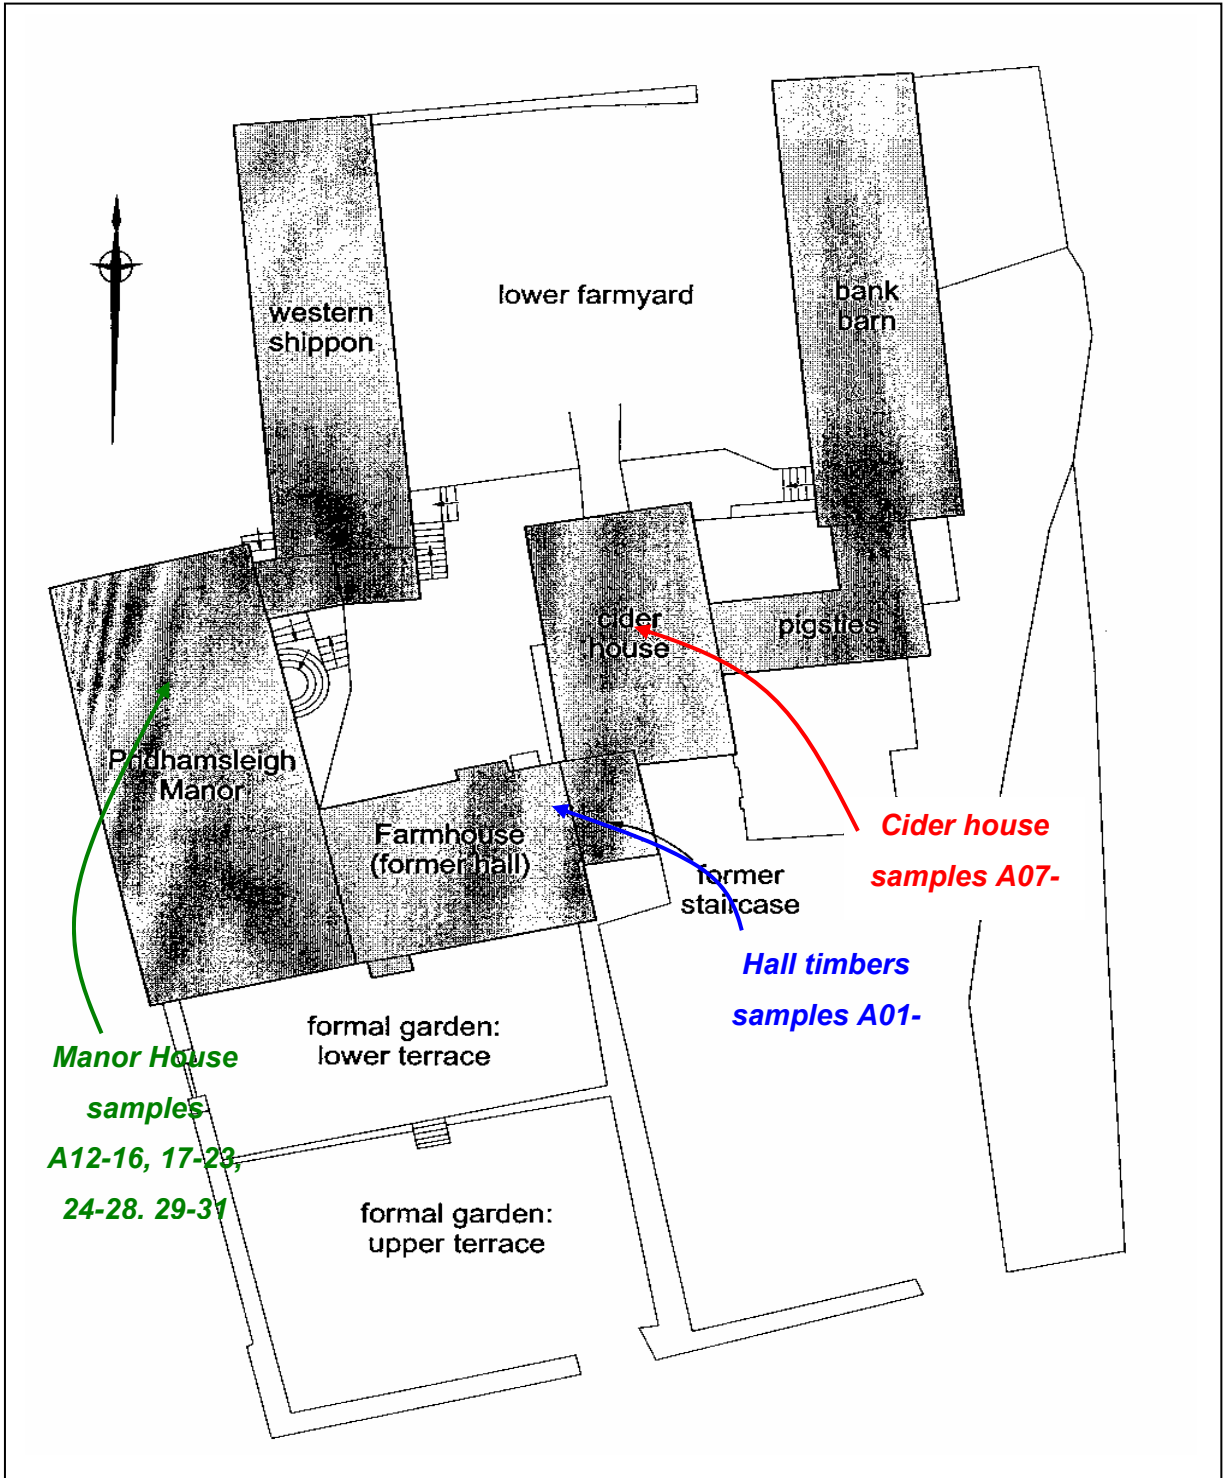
Plan of Pridhamsleigh to show location and arrangement of specific buildings
